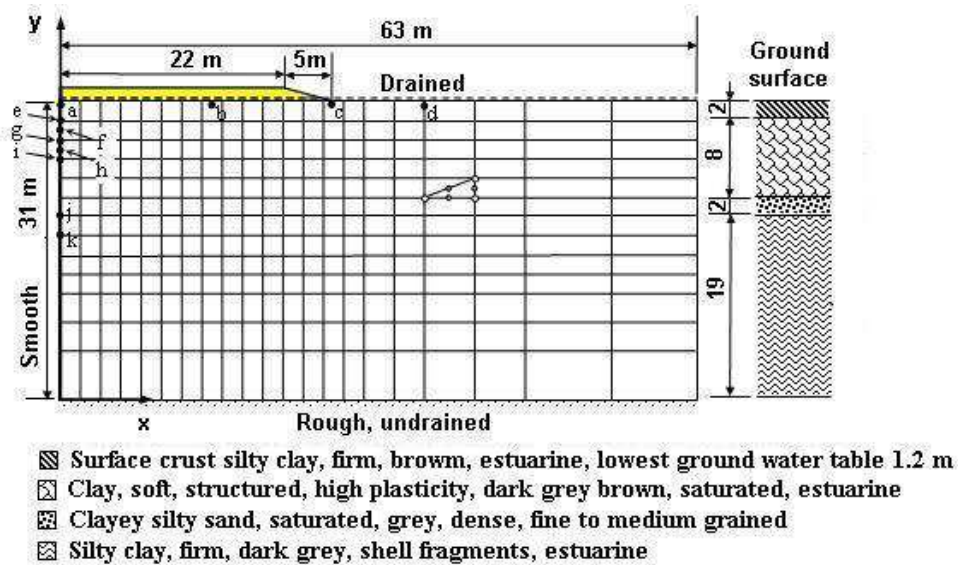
Teven Road trial embankment: Finite element mesh and typical soil profiles.
